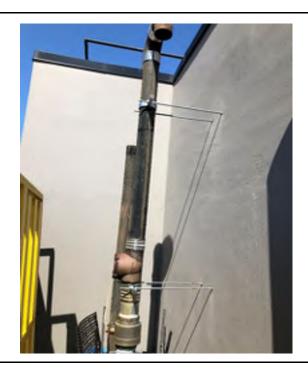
V6 riser and sample port in good condition, facing northwest. 8 April 2021.
